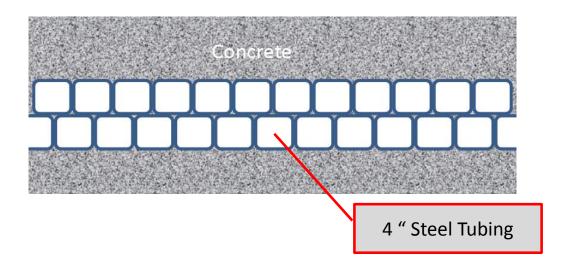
End view of the cavern wall showing veto tubes embedded in concrete in the walls of the cavern.
